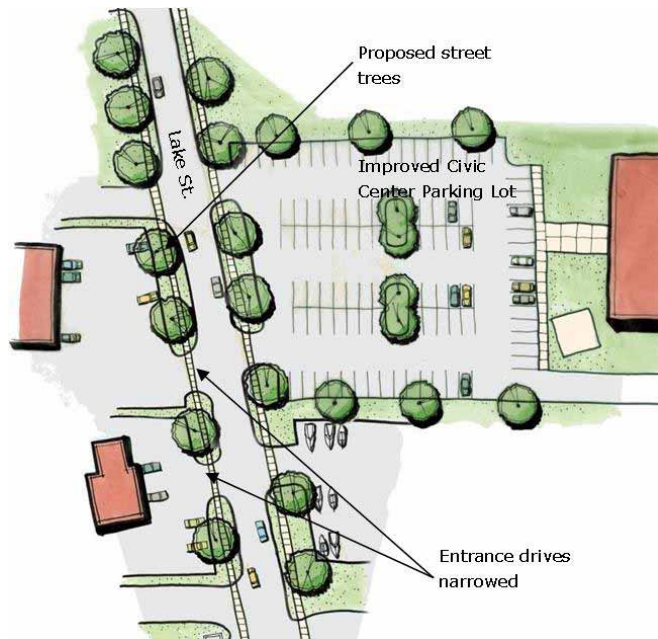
Proposed Plan, Civic Center/ North Streetscape
